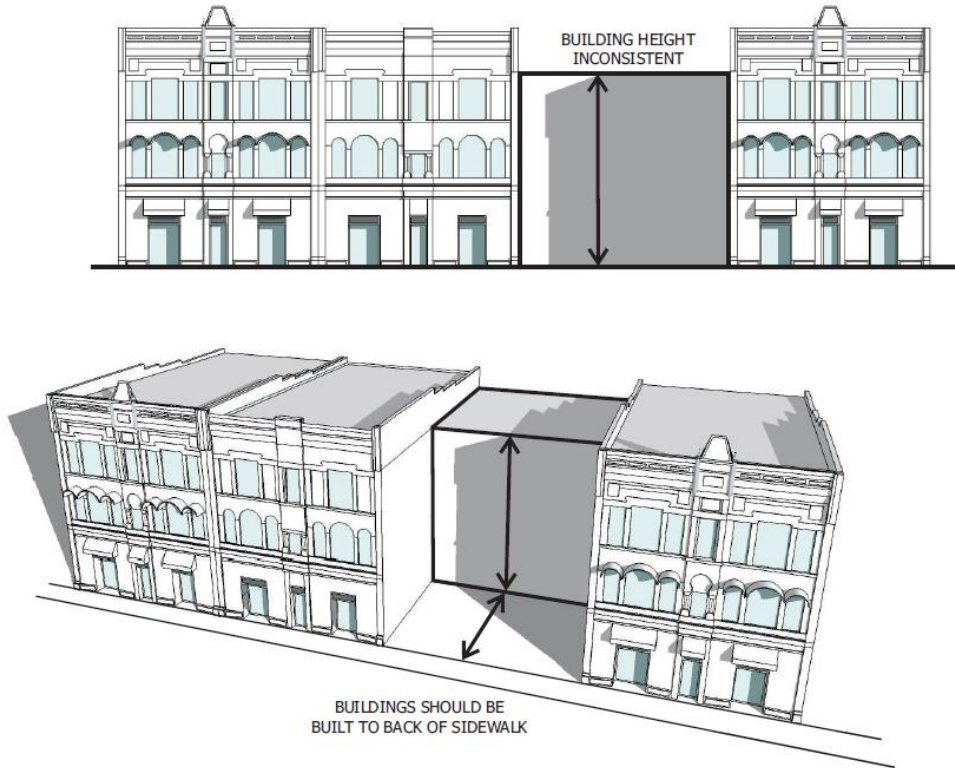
D: Buildings should be built to the back of the sidewalk. Buildings should not be set back behind the front facade of adjacent buildings unless they are creating a pedestrian amenity such as a courtyard or small urban plaza.
